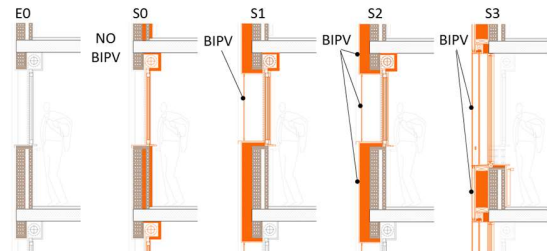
South façade section for each renovation scenario. In orange: added or modified construction elements.
